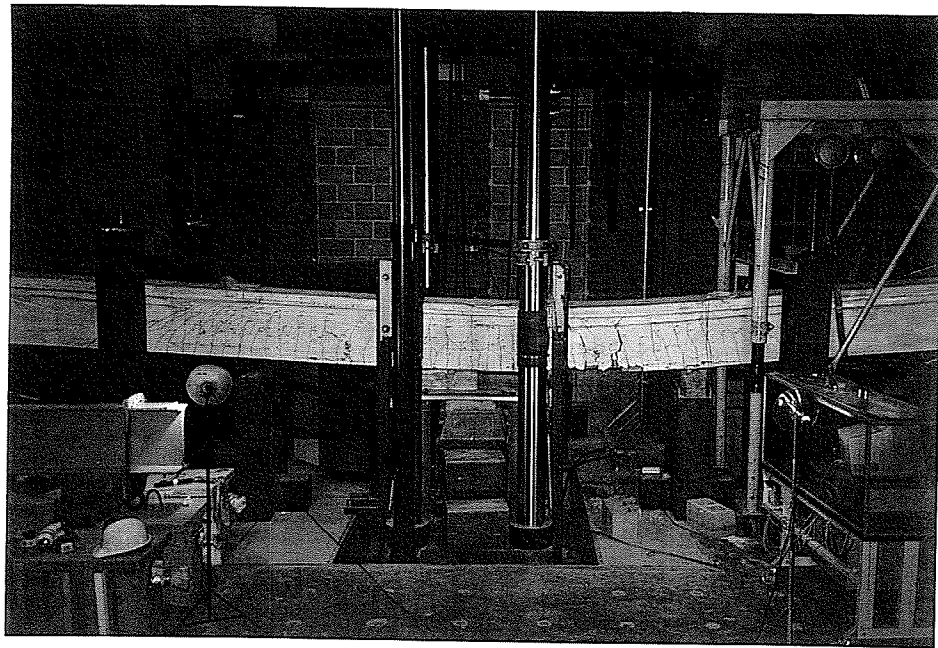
(c) Failure mode of beam TR-3-5/7
